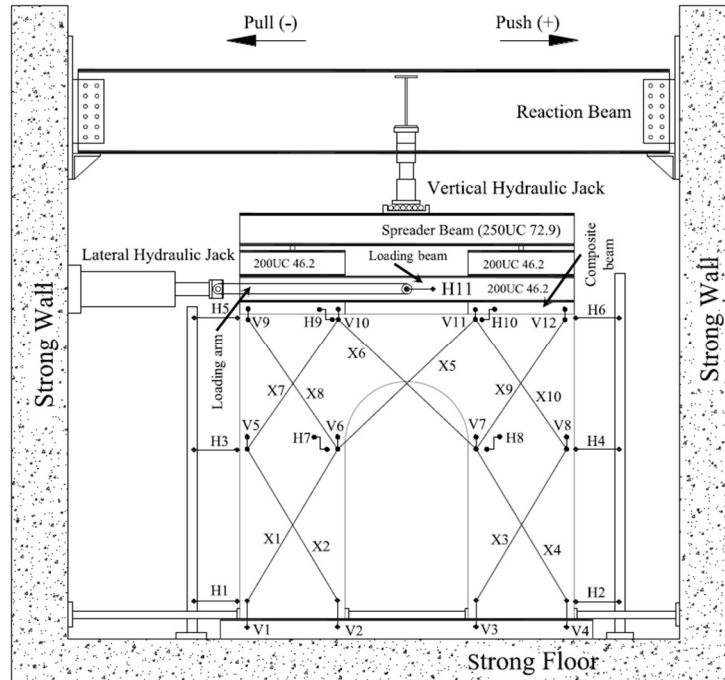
Elevation of experimental wall test setup and instrumentation [9]
